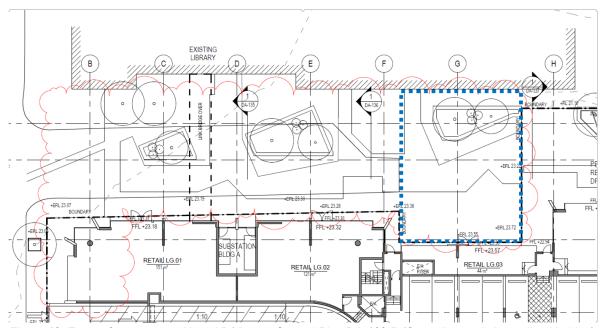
Extract from approved Level B1/Lower Ground Plan DA-109 P (Council owned site outlined in blue)
